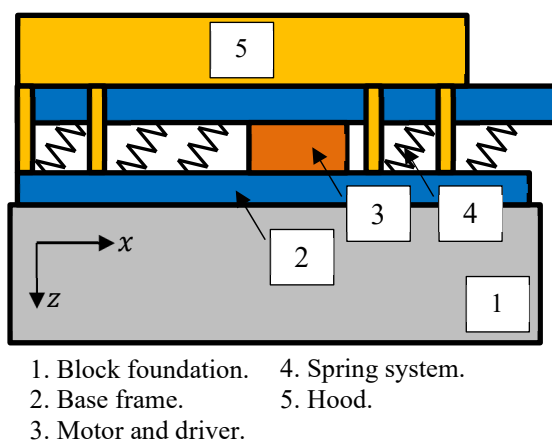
Illustration of the machinery on the block foundation (elevation view).
